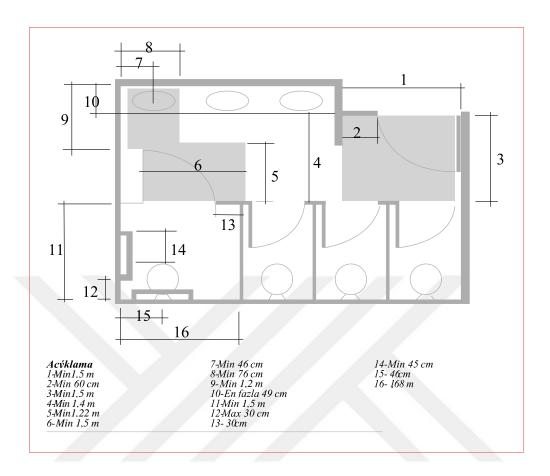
Public Toilet Plans and Dimensions with Multiple Cabinets (TS 9111, 2011)
